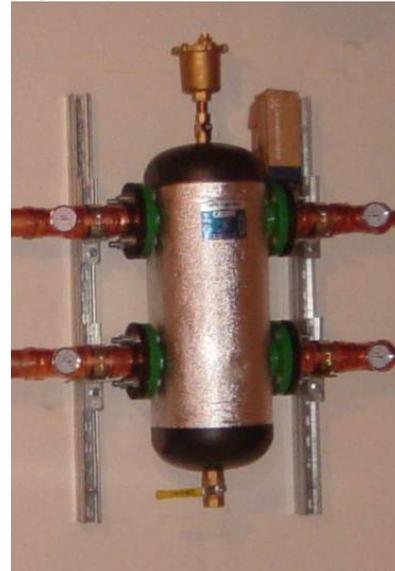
shows onsite fabricated insulation covering a large hydraulic separator in an industrial heating system.
